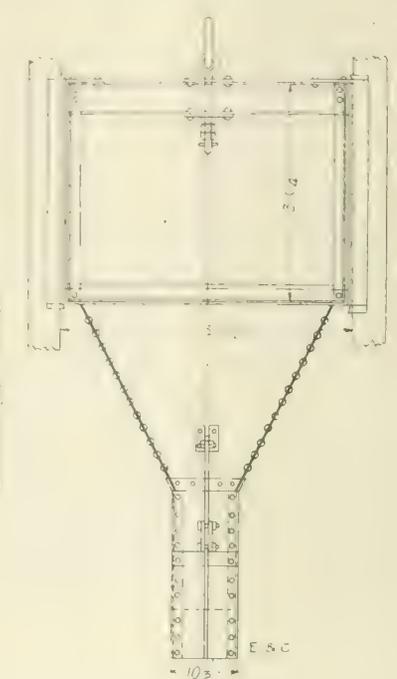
Detail of Hopper for Lowering Concrete in Palms Mine Shaft.
